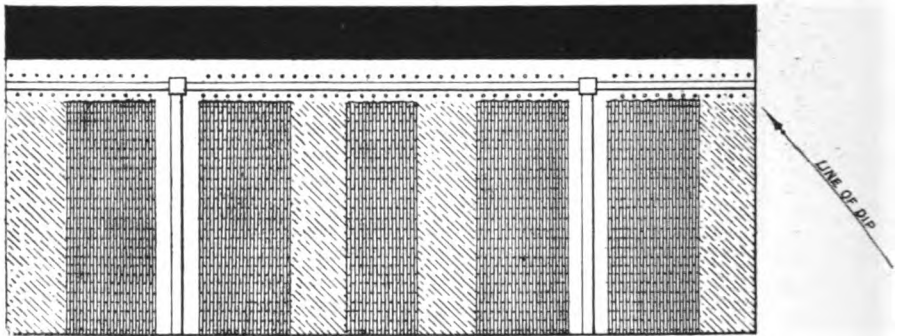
CANNOCK WOOD COLLIERIES, SOUTH STAFFORDSHIRE. PLAN SHOWING LONGWALL FACE IN THE DEEP COAL SEAM, AND THE STALLS, PACKS, AND PROPS CONNECTED WITH IT.
